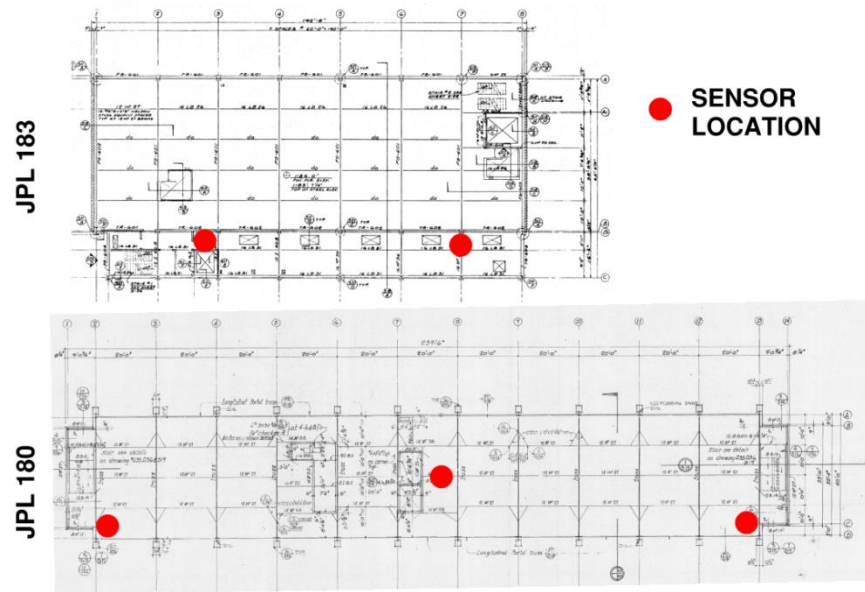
Typical instrumentation locations on upper-level floors shown on scaled structural drawings for JPL Buildings 183 (top) and 180 (bottom). Note that the Building 180 deployment has an additional center seismometer for assessing diaphragm bending along frames.
